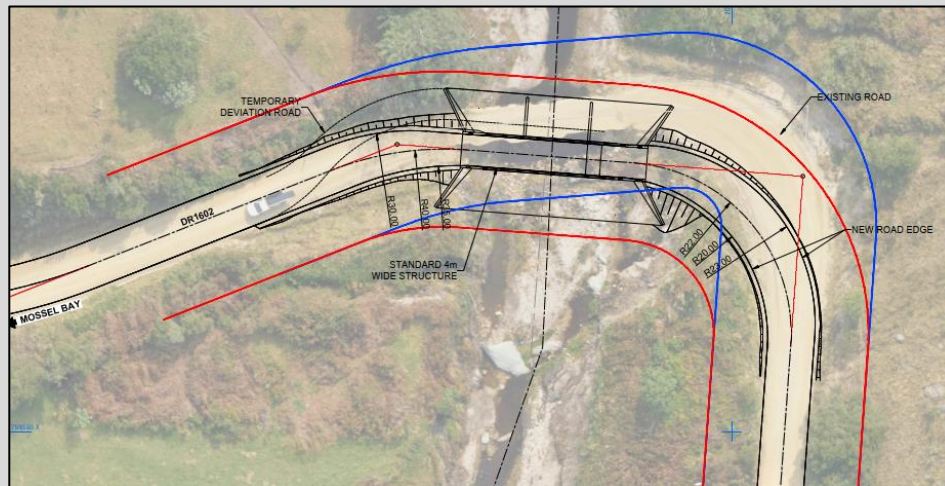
Proposed engineering layout of the new proposed causeway and culverts infrastructure showing the existing (blue) and new (red) road reserve, located on DR1602 km 8.4. (Hatch Engineering, 2026).
